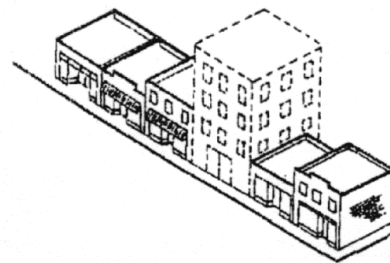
New building setbacks should be similar to adjacent historic buildings. See guideline 9.1.2.a.
